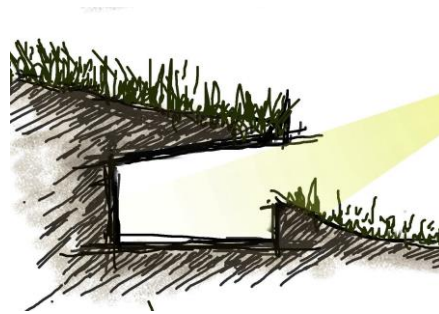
Lighting in underground houses with side openings (Sources Author)
